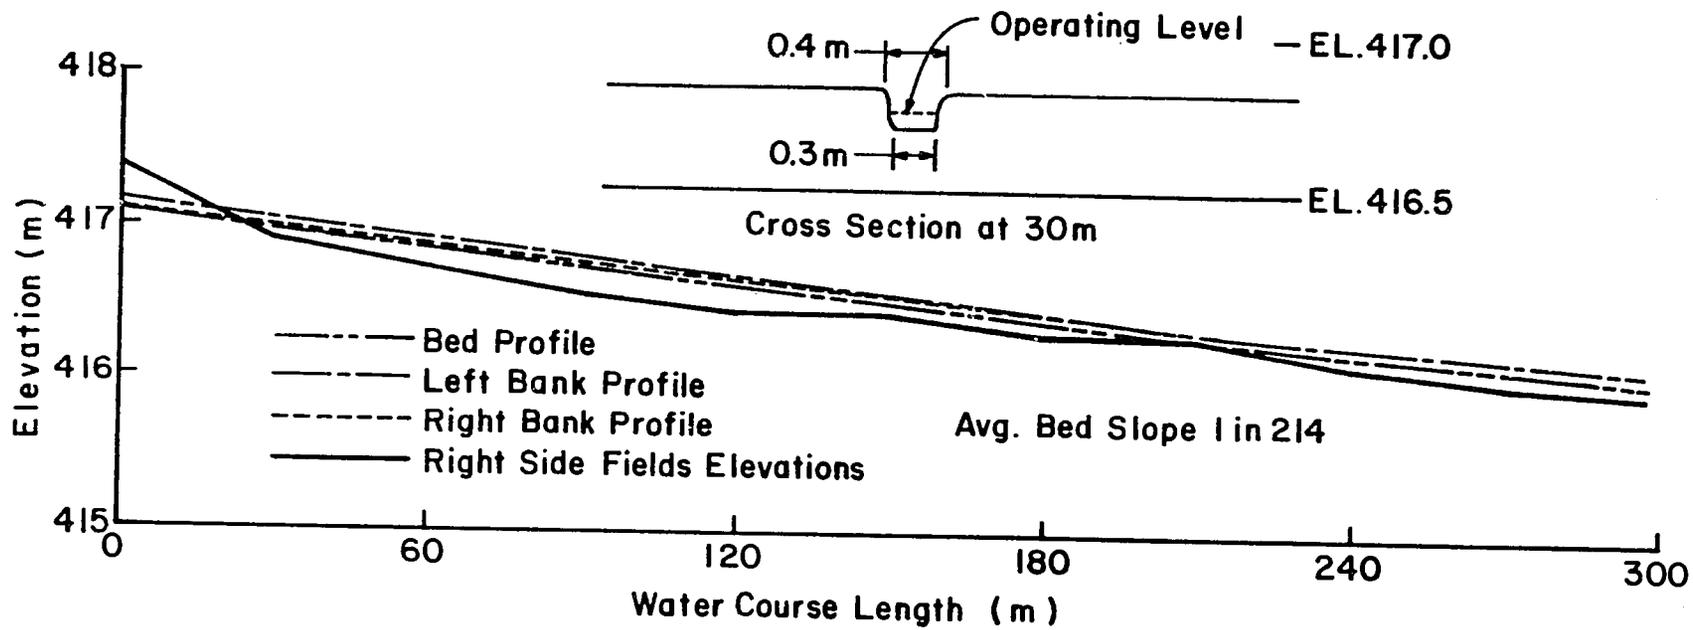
Longitudinal Section and Cross Section of Watercourse at Chain 6 + 49 Outlet of Rithola Minor
